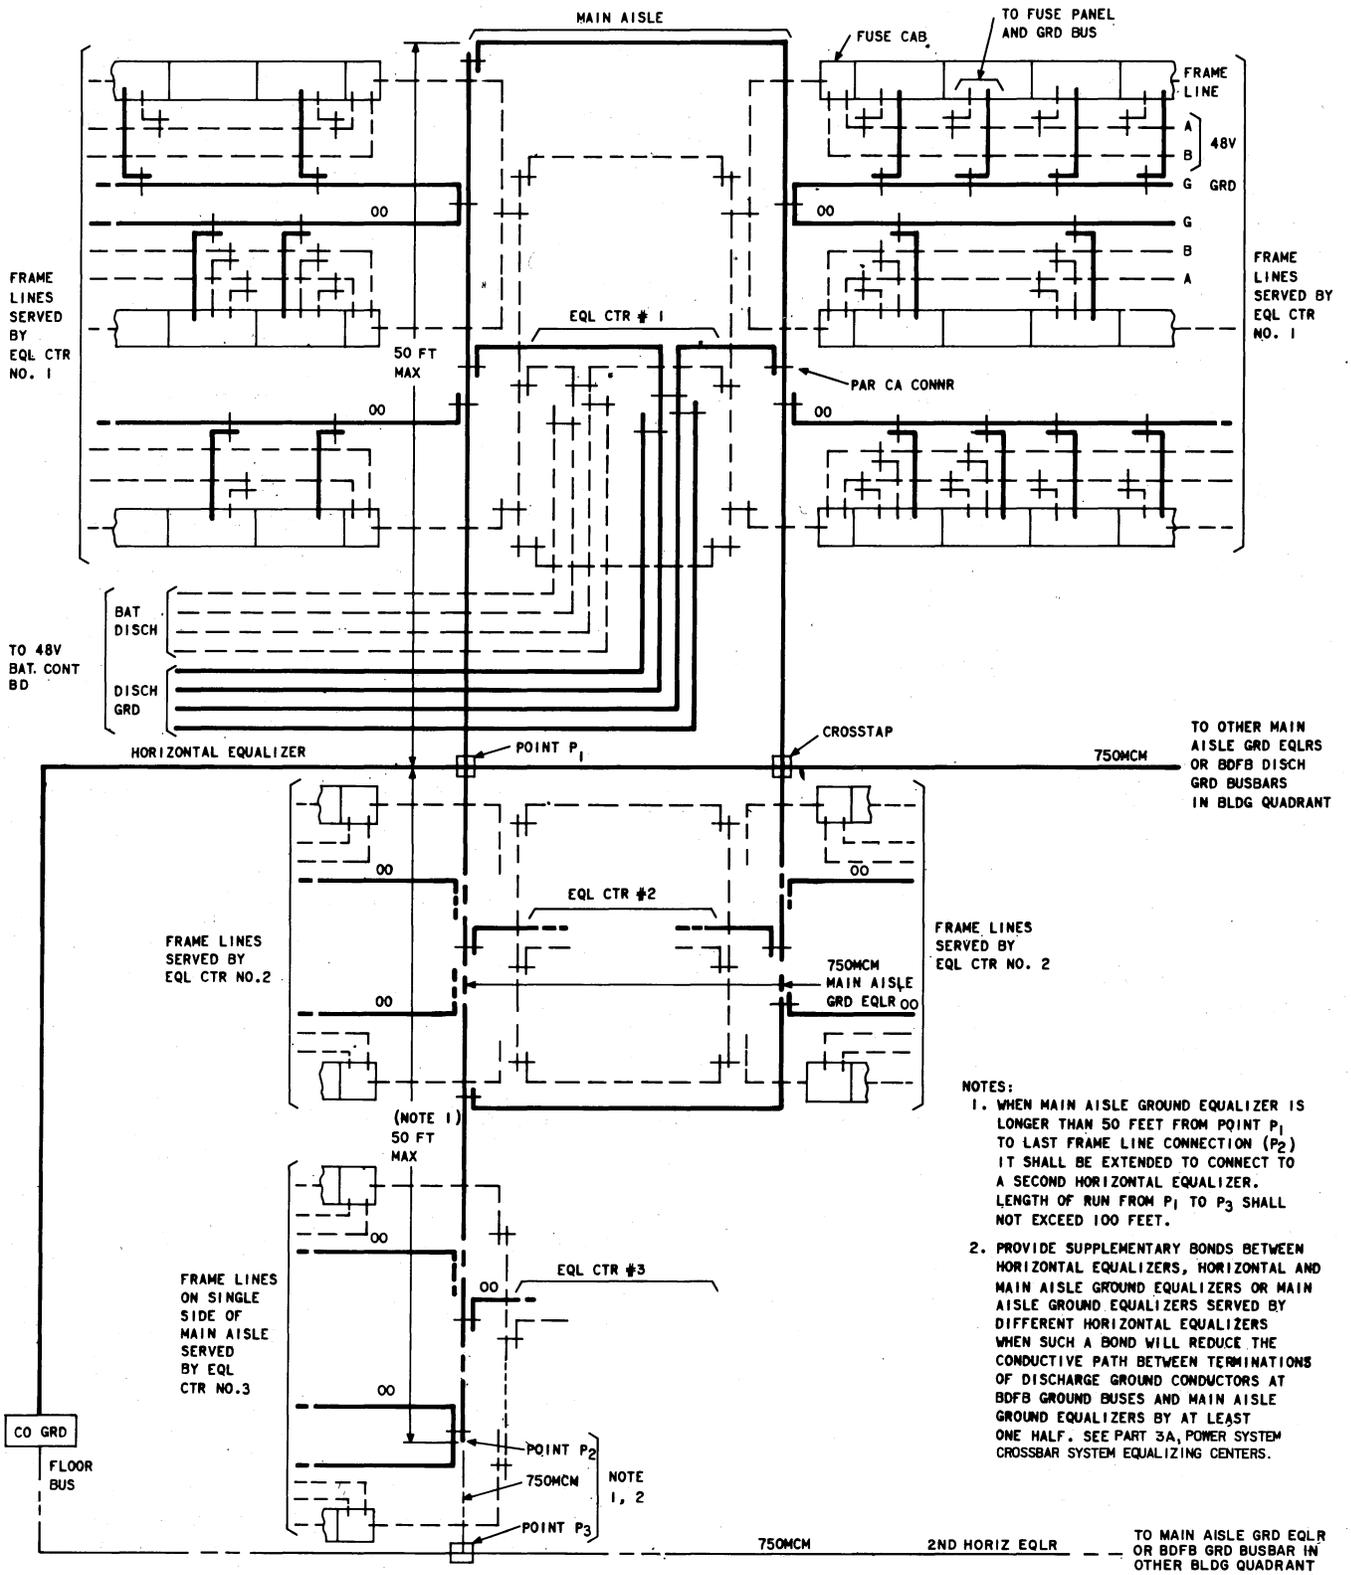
Method of Connecting CO GRD Horizontal Equalizer to Main Aisle Ground Equalizers (Typical No. 5 Crossbar Equalizing Center Arrangement Shown)
